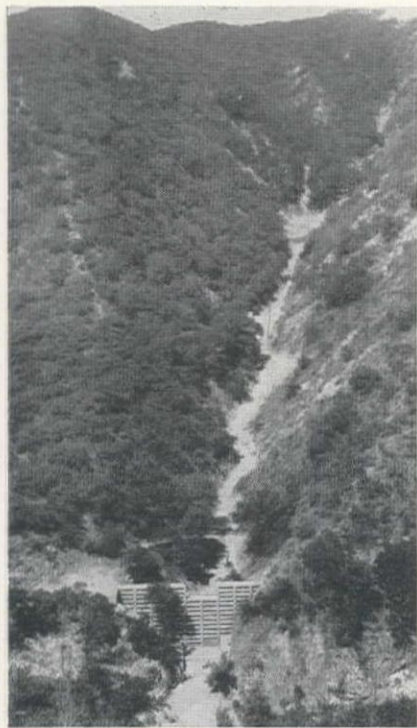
Rock-filled timber crib structure (foreground) is about 25 ft. high. Also note two other structures upstream illustrating the plan of barrier construction in such channels.
